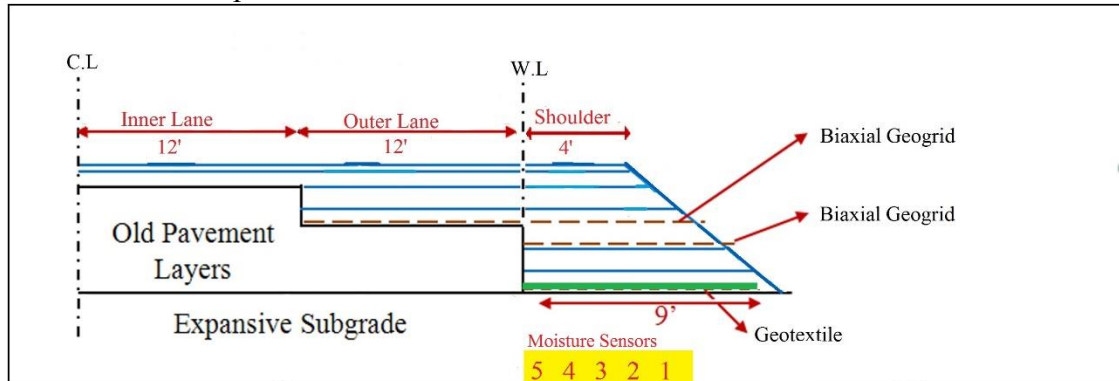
Sketch of Reconstructed SH-21 pavement structure with Sensor Installation
